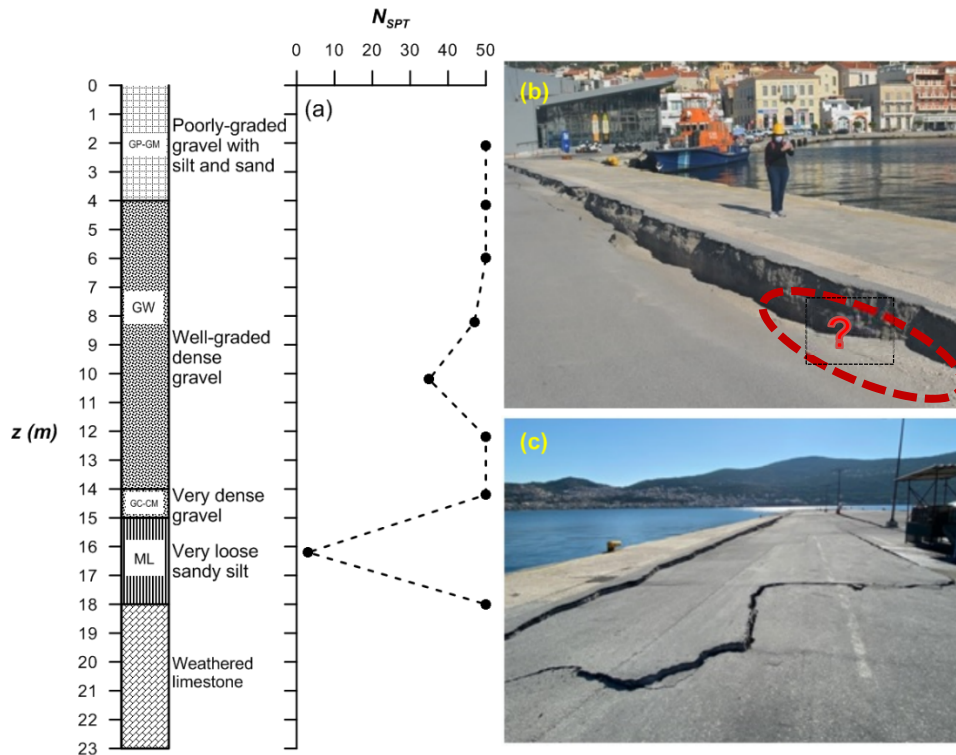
Top right (b): subsidence of backfill material behind the quay wall at the eastern (old) port, measuring up to 60 cm. Down right (c): 10 – 15 cm wide longitudinal and transversal open cracks, located on the pavement over the backfill material, in contact with the quay wall. Left part: a crude log of borehole S-1 located at the jetty of the old port where the liquefiable layer of the very loose sandy silt layer is located at a depth of 15 m (*borehole kindly provided by G. Millionis - elaboration by Em. Rovithis*)
